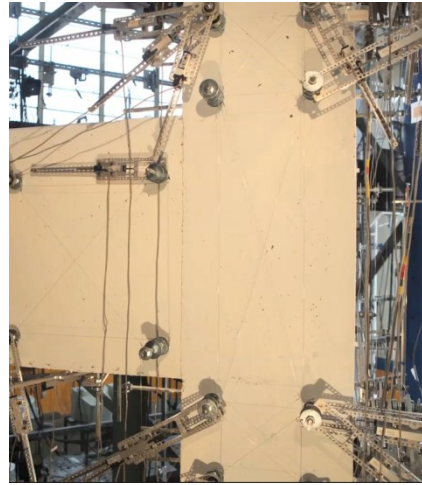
Instrumented specimen U-BJ-1 before testing
